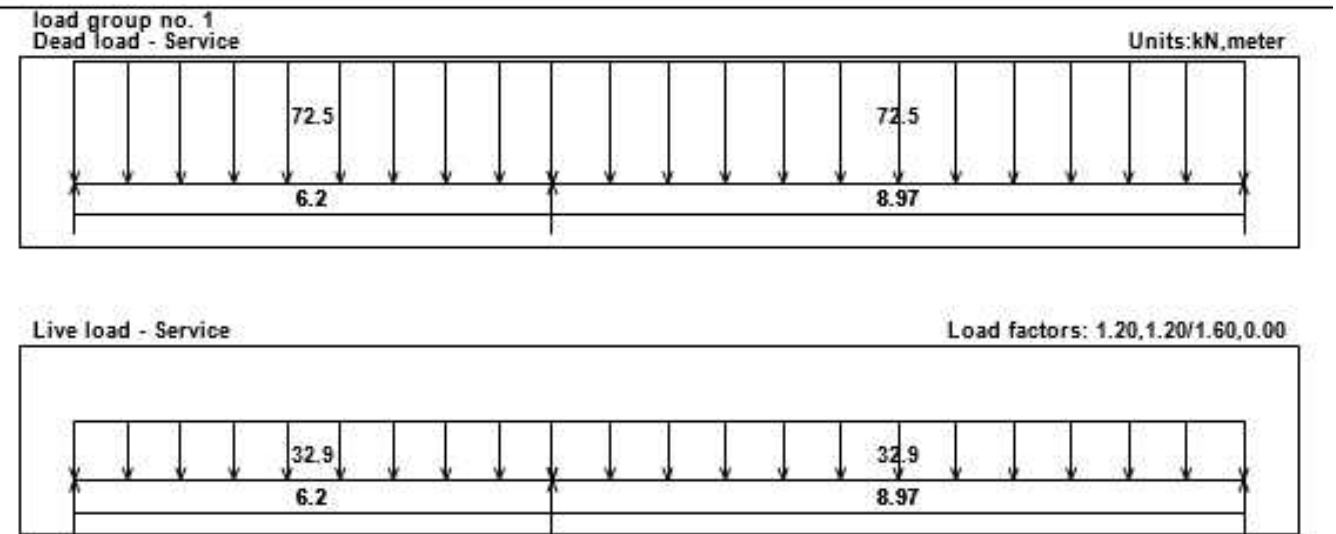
11) Dead and Live loads diagram for Beam 64 (KN)
